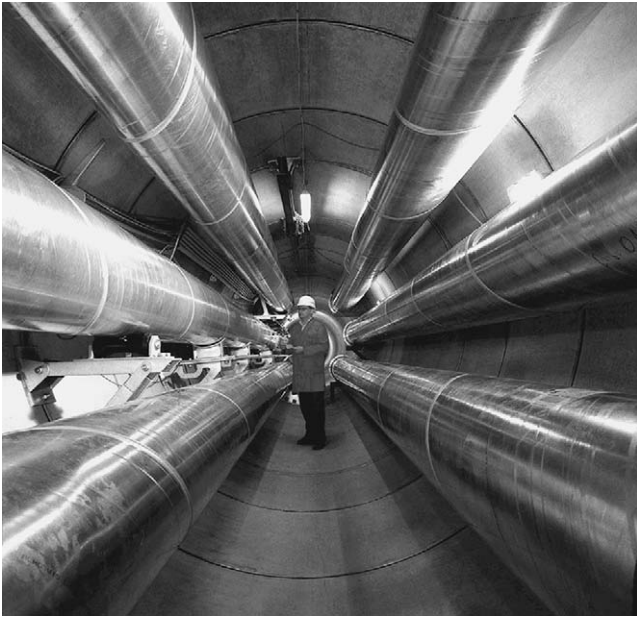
Cross section of an accessible tunnel with two 3 phase GIL systems.
